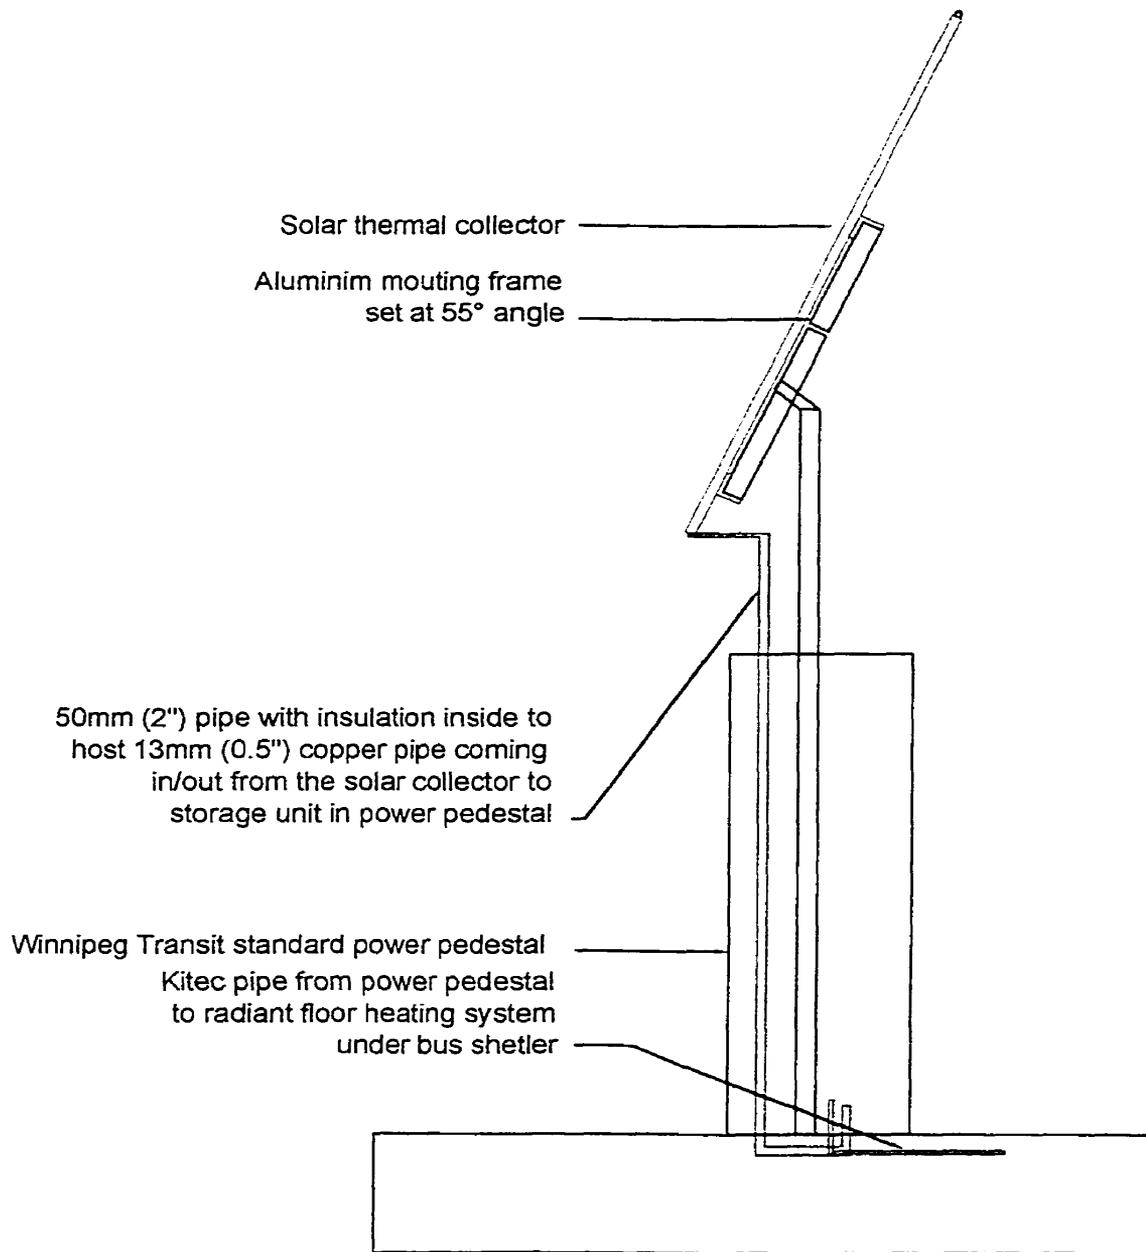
Solar Collectors Roof Assembly Scale: N.T.S.
